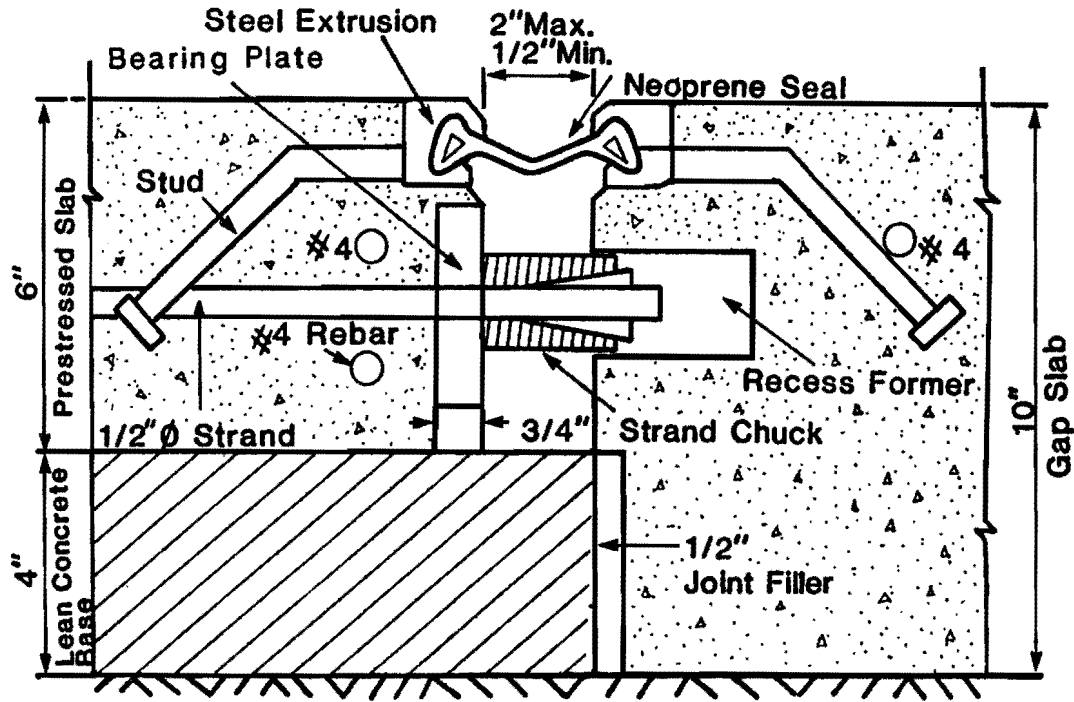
Typical joint assembly at strand anchor (Ref 68).
